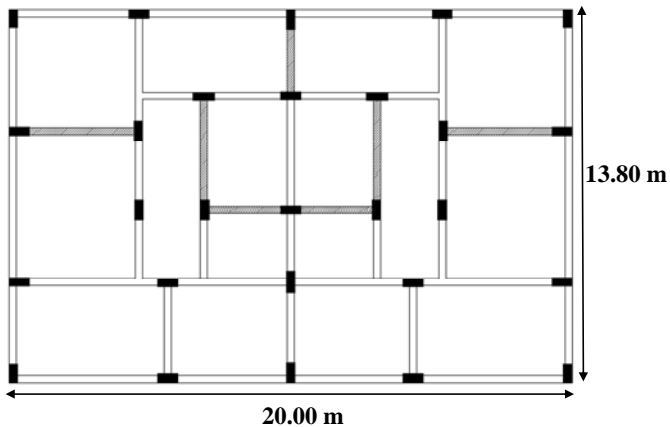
Example 7-story building plan view (load carrying infill-walls are shaded)
